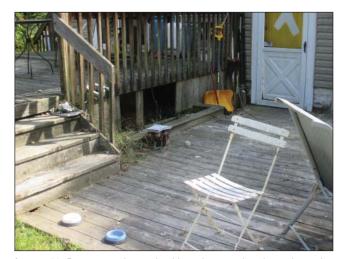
Rear at grade porch with rotting wood and wood panel on rear door.
